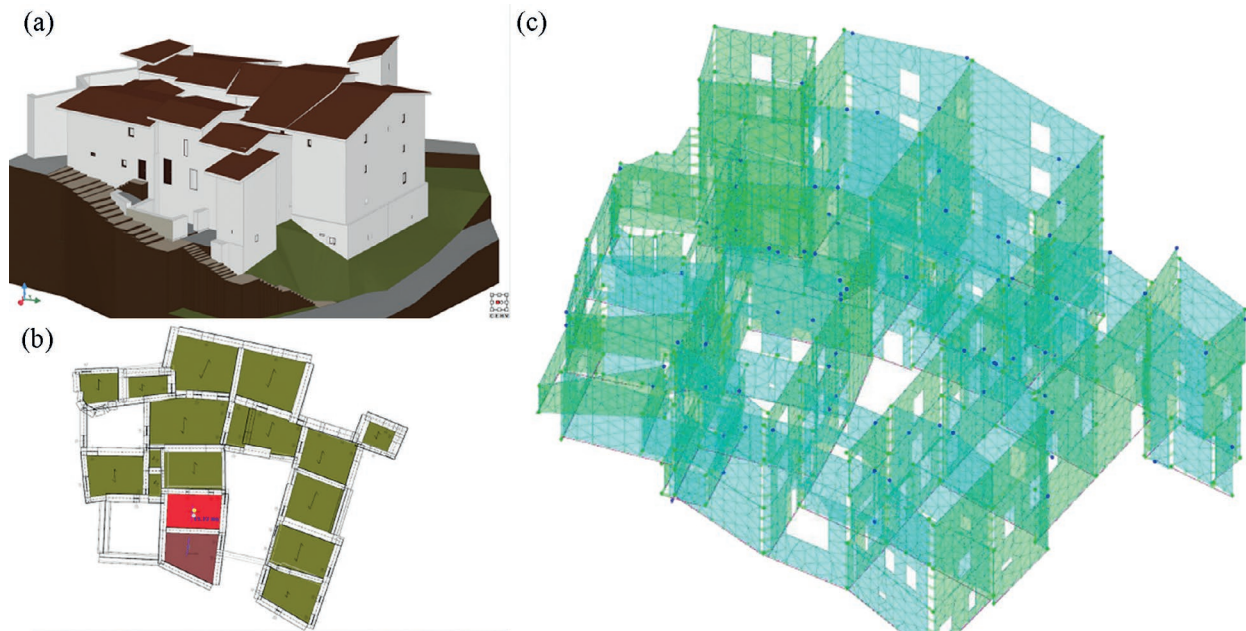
| Structural parametric model creation: (a.) automatic wall detection; (b.) floor modelling; (c.) structural model of the building aggregate.
